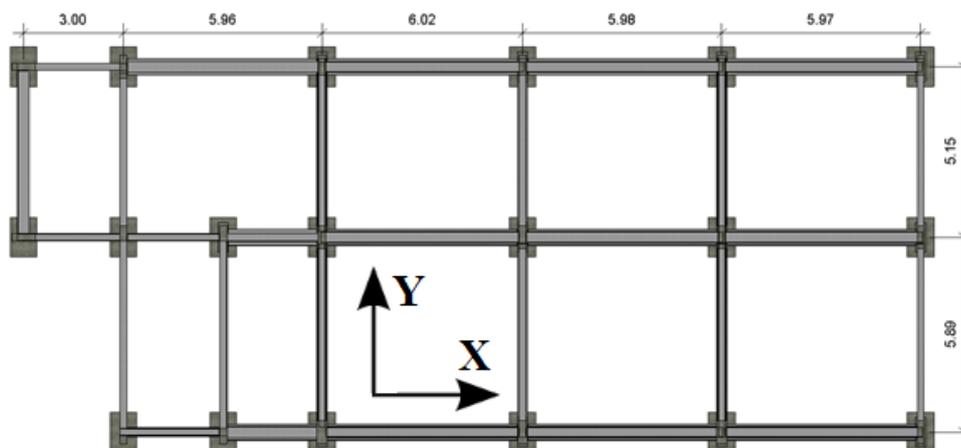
Plan of the case-study building at Level 1-3 (Units: m)
